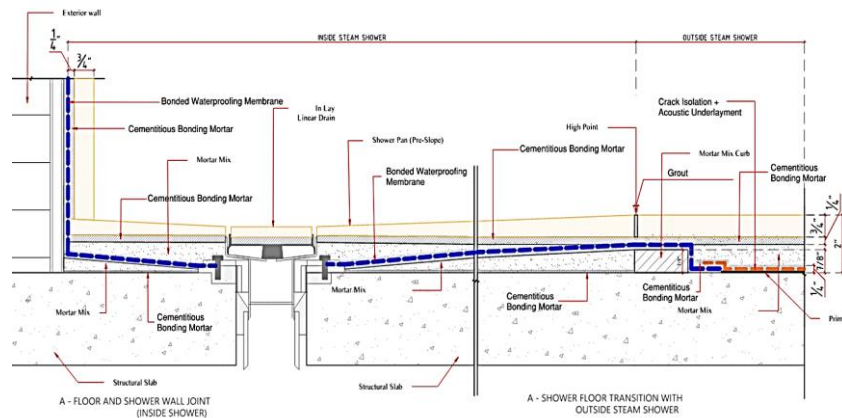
Steam-Shower Floor Section Showing Sloped Mortar Build-Up to A Linear Drain and Continuous Waterproofing at the Wall-To-Floor Interface and Curb Transition
